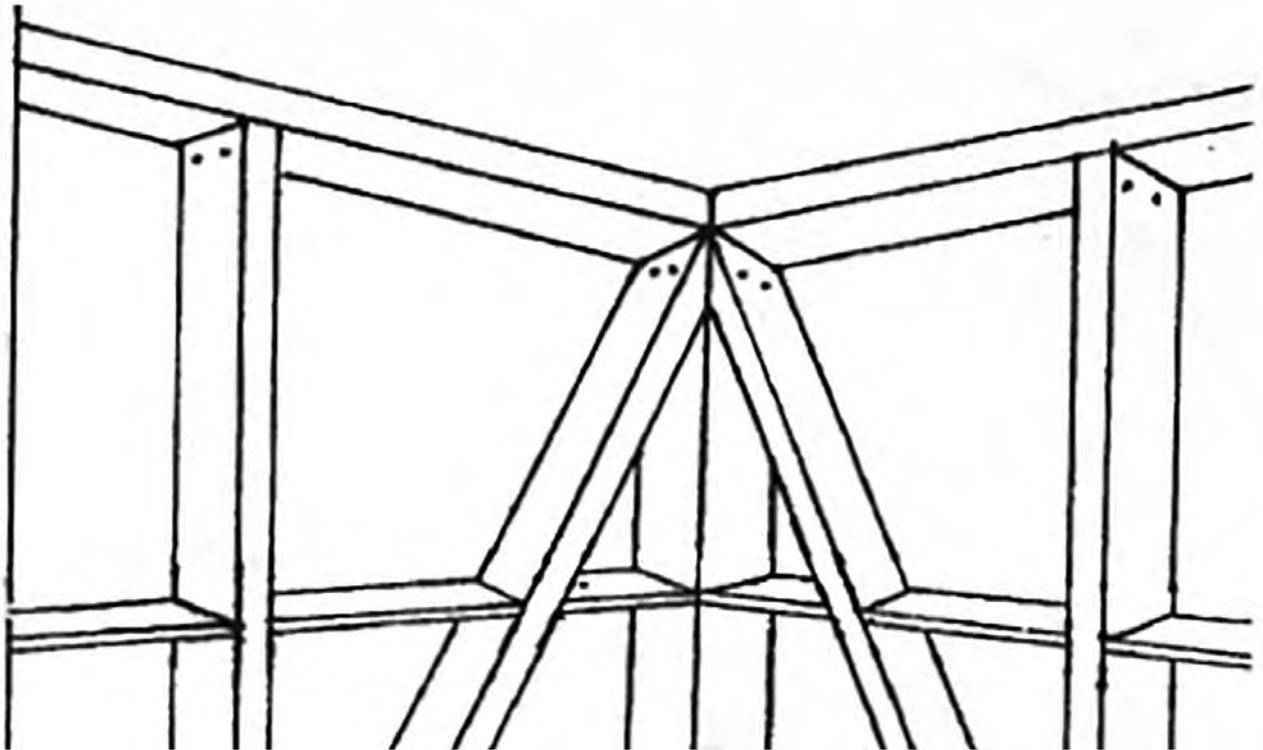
WALLS MUST BE BRACED IN THE CORNERS
